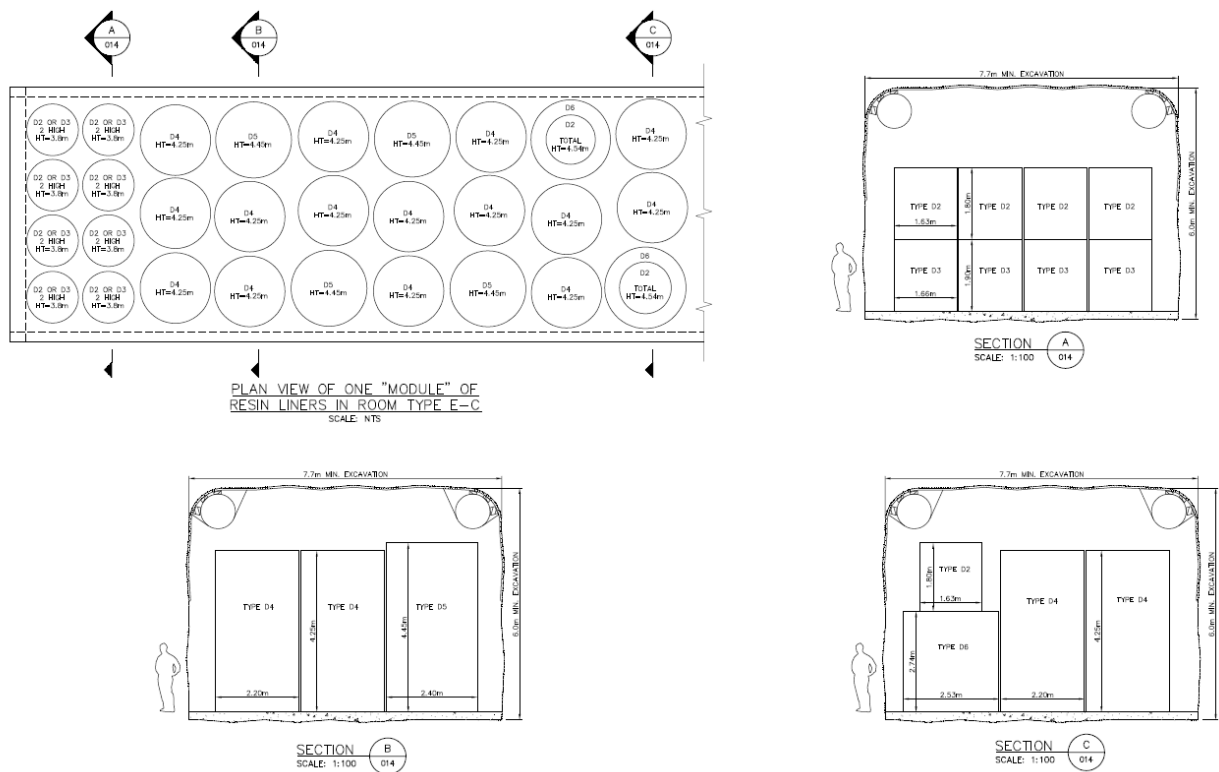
Stacking Arrangements for E-C Emplacement Rooms in the East Panel (Hatch 2008)
